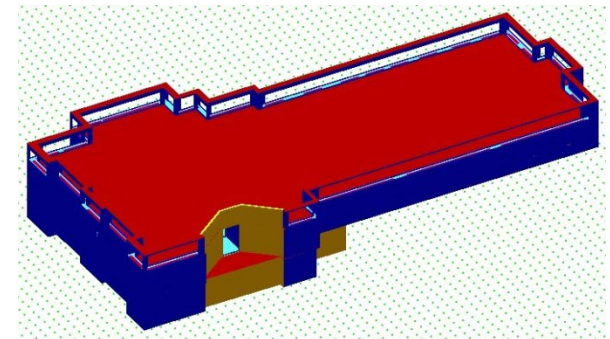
Modelled Building by Double Skin Facade and Roof Tower
